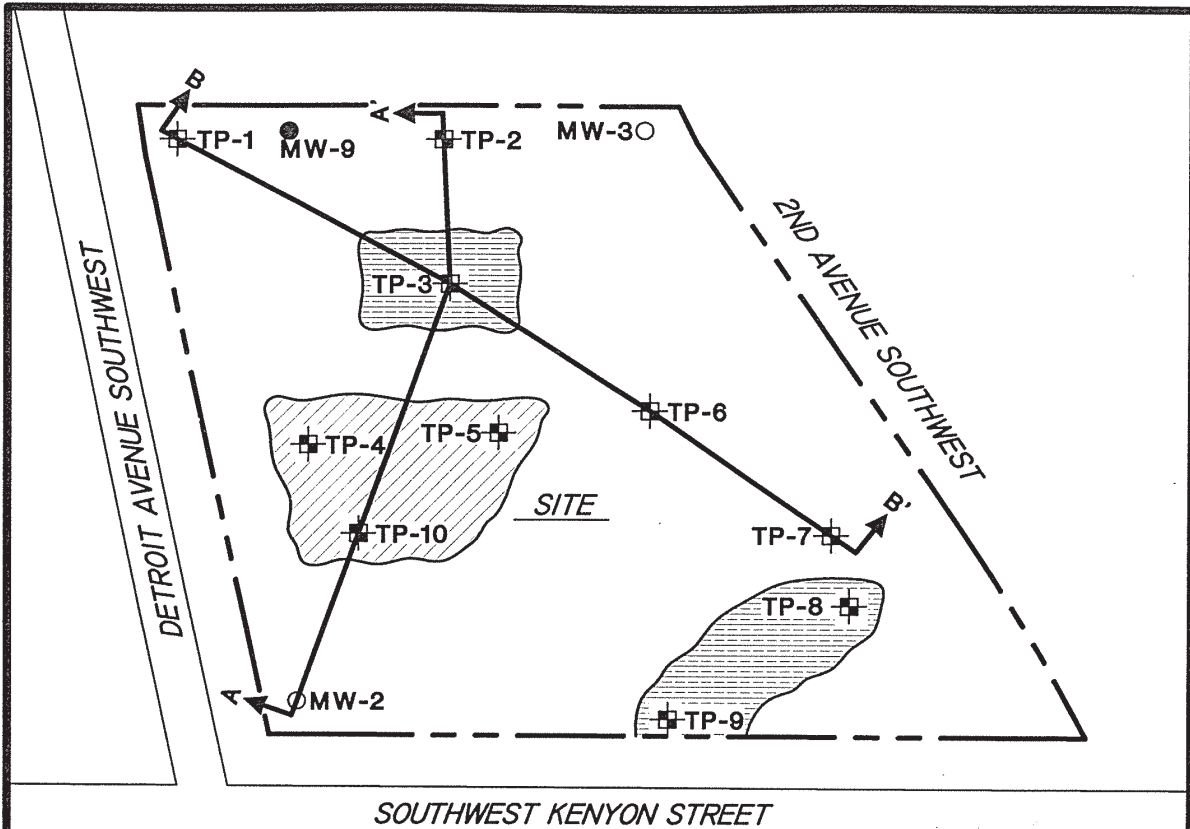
Sampling Locations Near Former First Avenue Bridge Landfill
